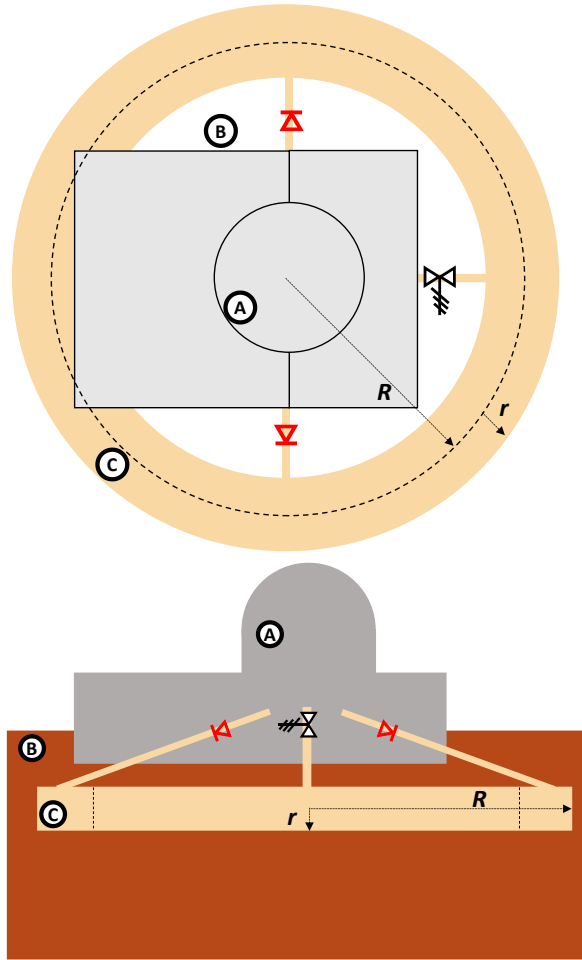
Top and side views of the underground toroidal containment extension building (not drawn to scale)
